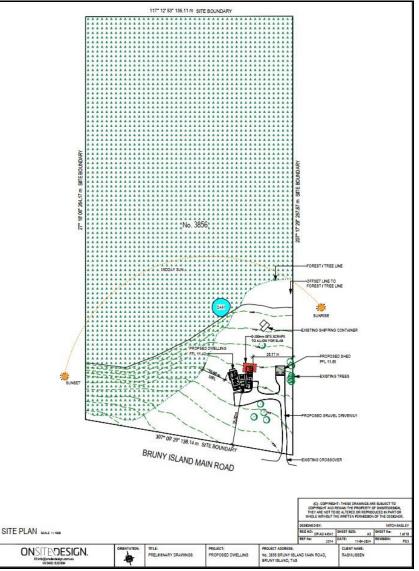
Site plan, 3856 Bruny Island Main Road, Alonnah (Ref – Onsitedesign, L. Rasmussen, 3856 Bruny Island Main Road, Bruny Island, Tas. Ref No: 2314, Sheet No: 1/10, Rev: PD1).
